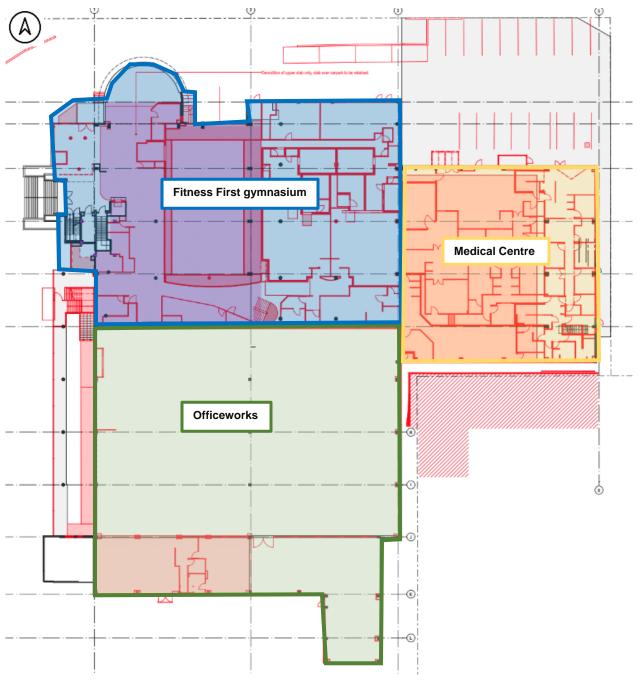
Excerpt from Level 1 Demolition Plan_800 showing the retail and commercial tenancies within 800 Pittwater Road (Source: Tonkin Zulaikha Greer, drawing no. A-041, 23.08.2019)
